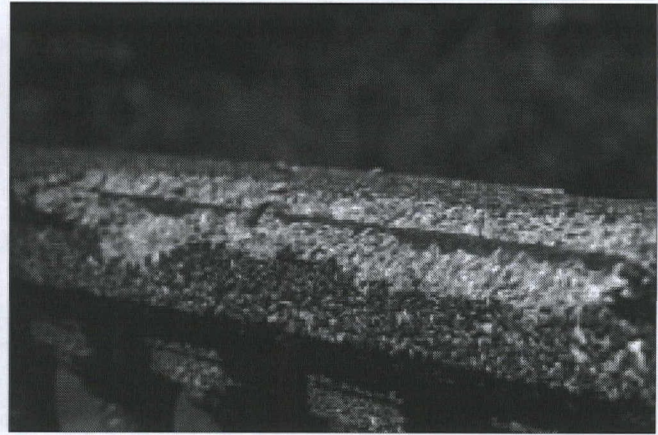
Section of top rail above the 16th Street entrance deteriorated with exposed reinforcing steel, 1997, see plan sheet 28 (Land Ethics, Inc.).
